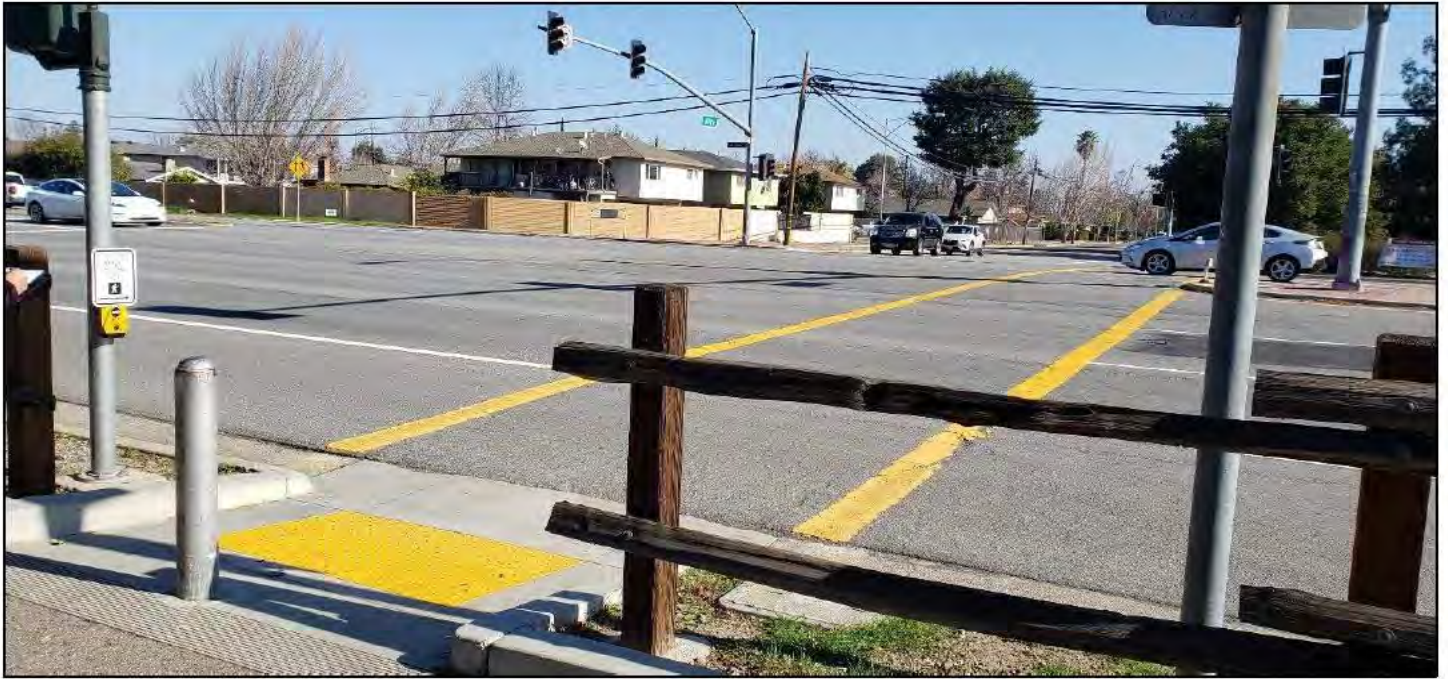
View of the existing crosswalk at Lawrence Expressway and Mitty Way from the project site.
